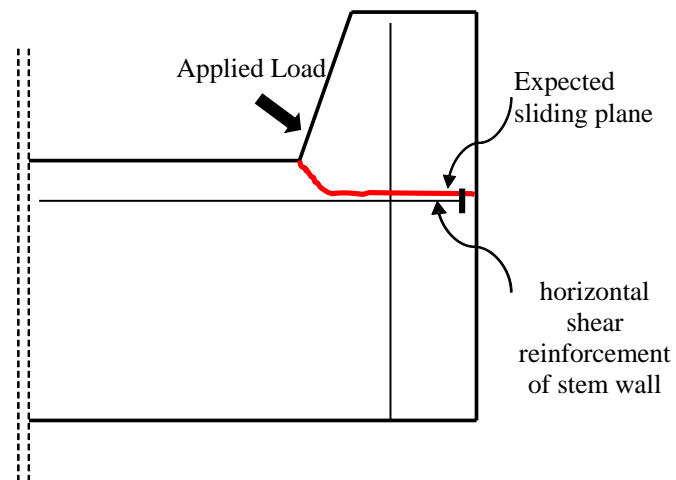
Assumed crack pattern in a monolithic shear key at failure
